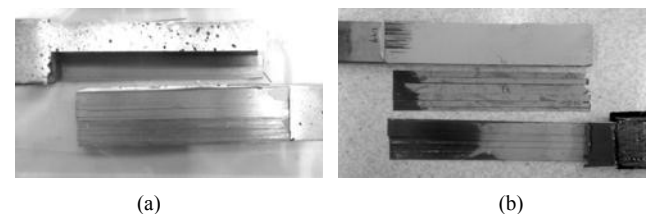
Typical failure mode of Araldite specimen: (a) Araldite specimen; (b) Sikadur specimen
